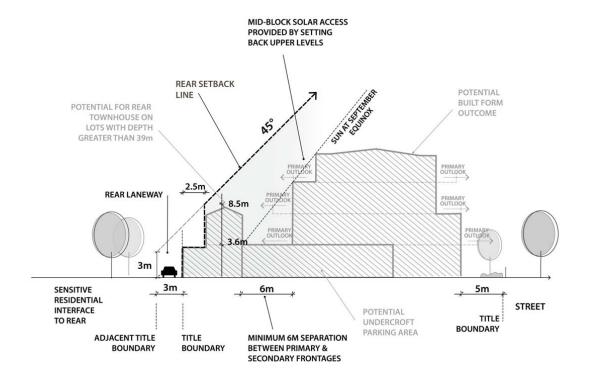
Rear Building Setback Profile: sites with abutting laneway (cross section)
